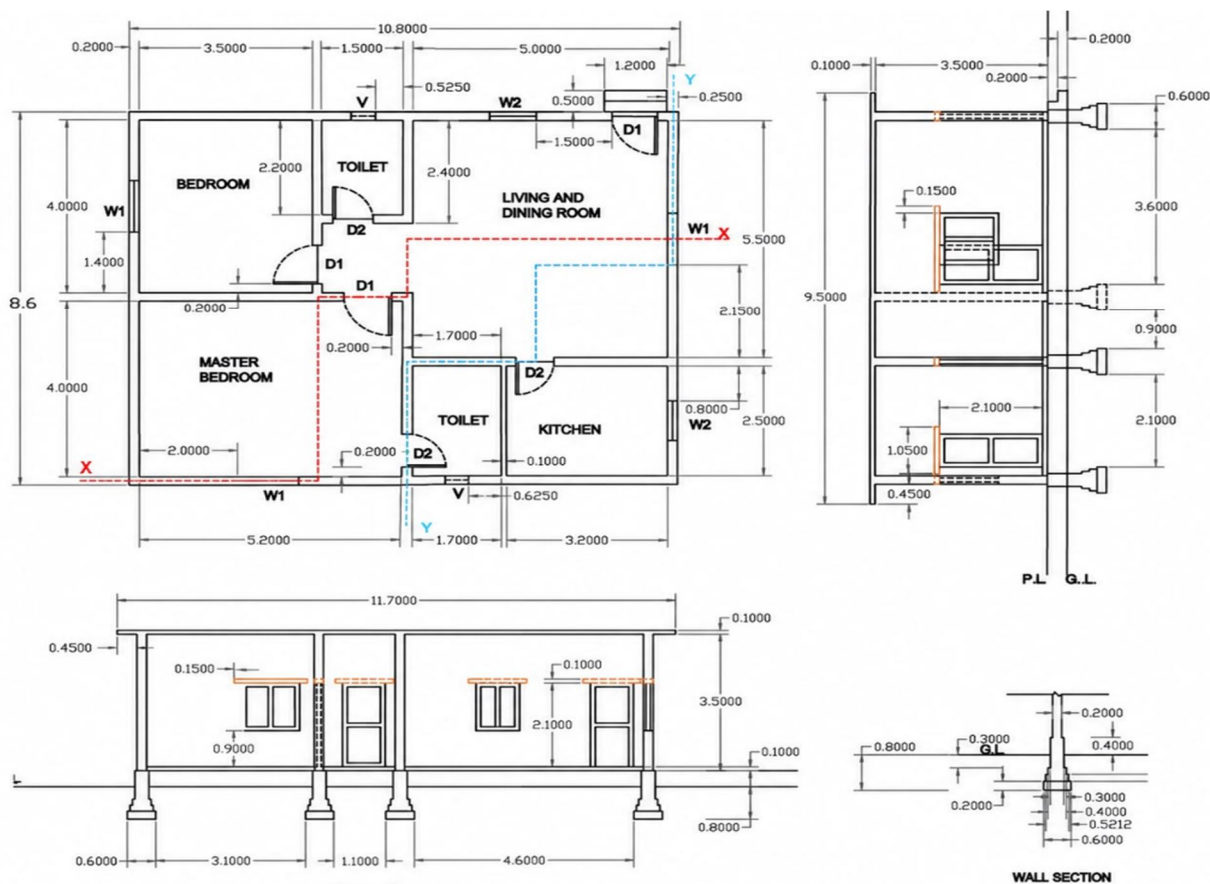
Detailed plan, section at XX, section at YY and wall section of low-cost housing
